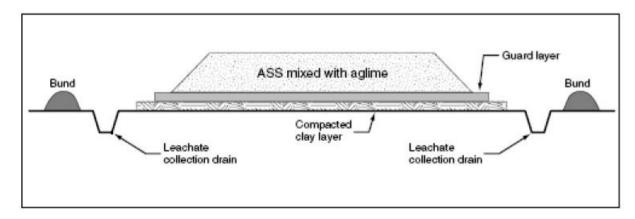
Schematic cross-section of a treatment pad, including clay layer (or hardstand concrete layer), guard layer, leachate collection system and containment with bunding.
